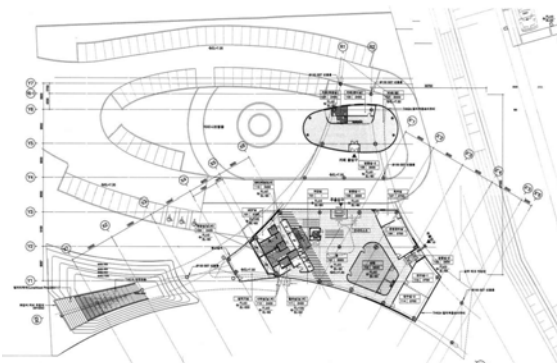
1<sup>st</sup> Floor Plan of Ara Marina
